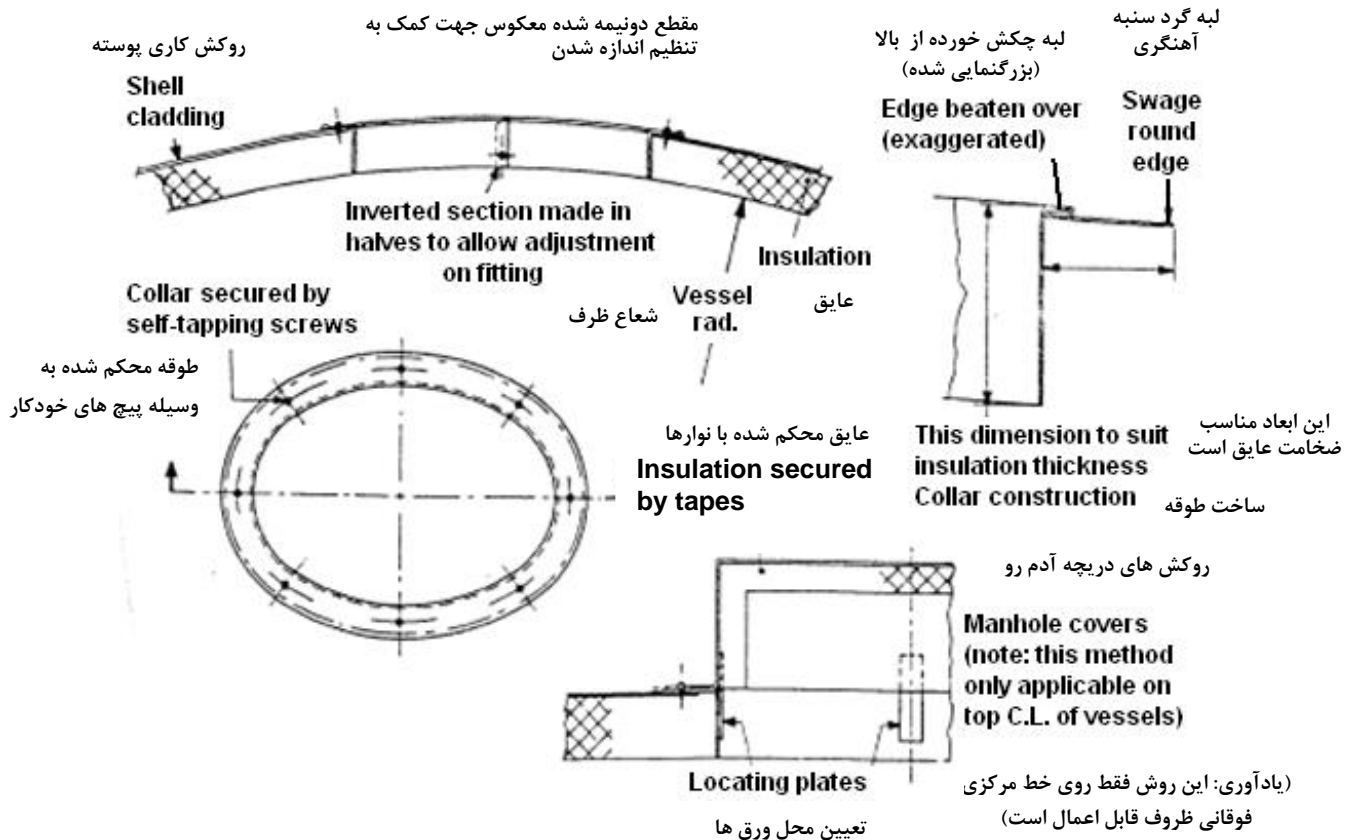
DETAILS OF INVERTED COLLARS AT MANHOLES, ETC.
